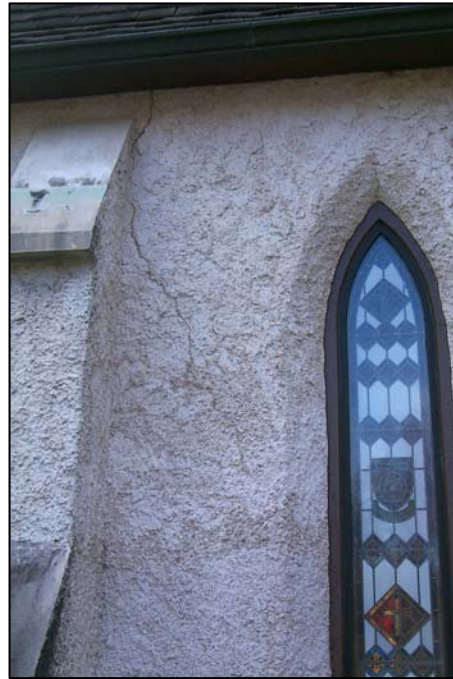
More cracking on the exterior render running along the brick buttress. (Photo: Cummings and McCrady Architects)
